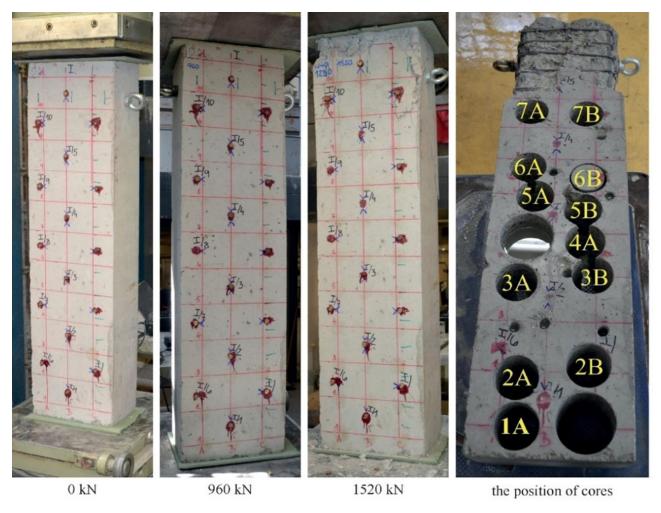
Concrete column under load of various degrees: at 960 kN, the first cracks began to form in the corners of the upper part of the column; at 1520 kN damage to the upper third of the column is clearly visible (on the left and in the middle) and after cores were taken (on the right).
